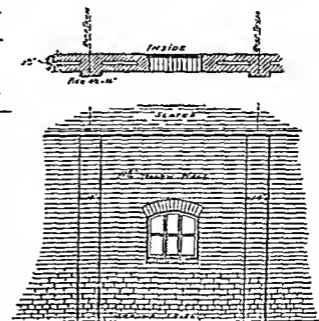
Plan and elevation of a 12 inch thick hollow brick wall with piers outside and occurring at each roof truss.
